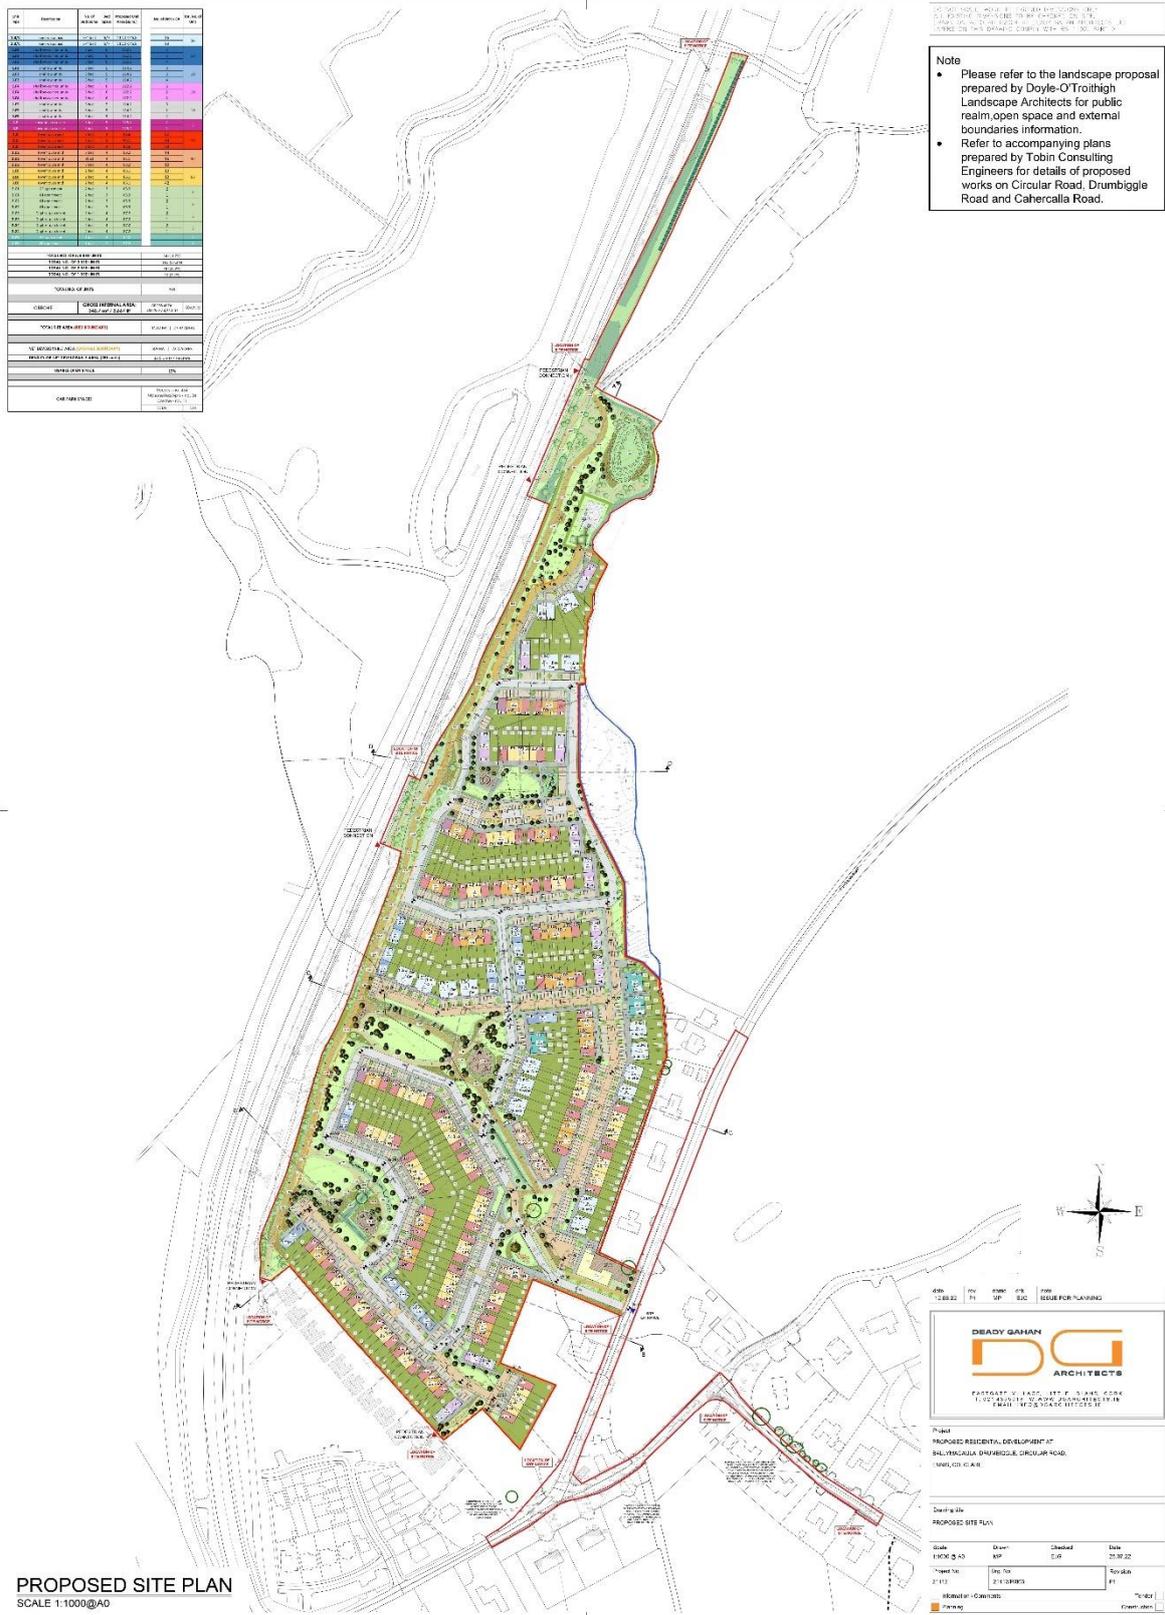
PROPOSED SITE LAYOUT (DG ARCHITECTS, 2022).
